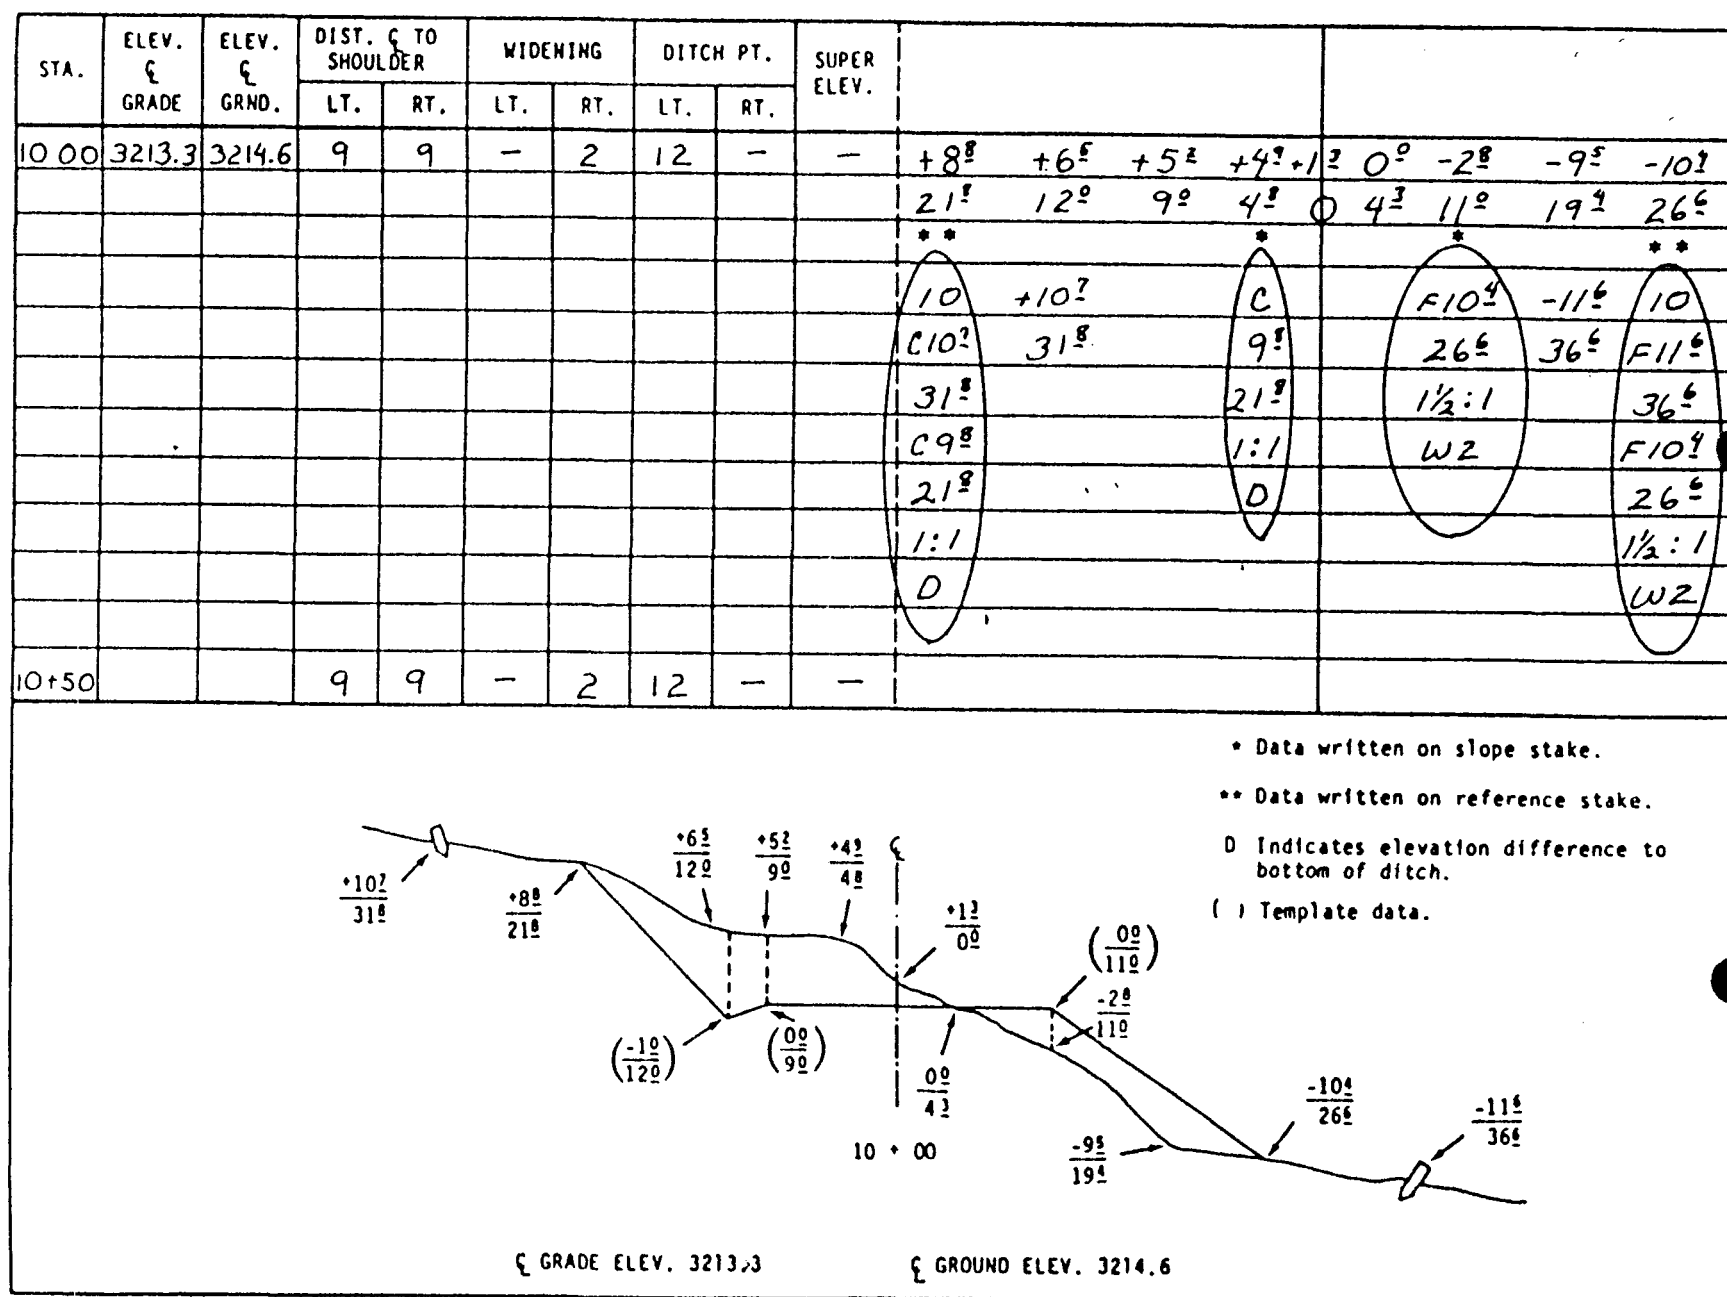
Slope-stake note entries related to actual ground elevations.
